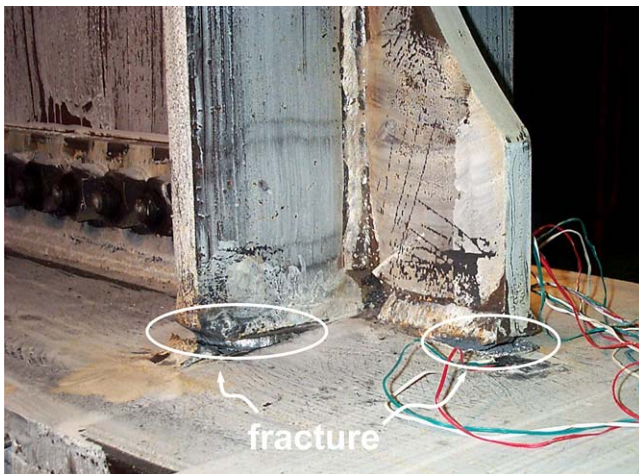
Fracture of CJP groove weld of specimen BR115CB.
